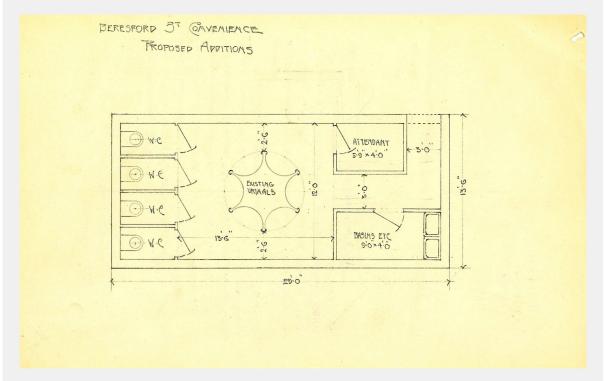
Floor plan of proposed alterations, 1914. ACC 219/247d
